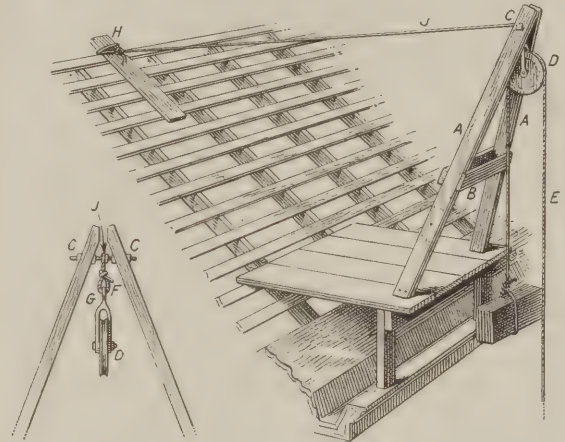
Details of One Form of Derrick Used in Raising Slate to Roof.
